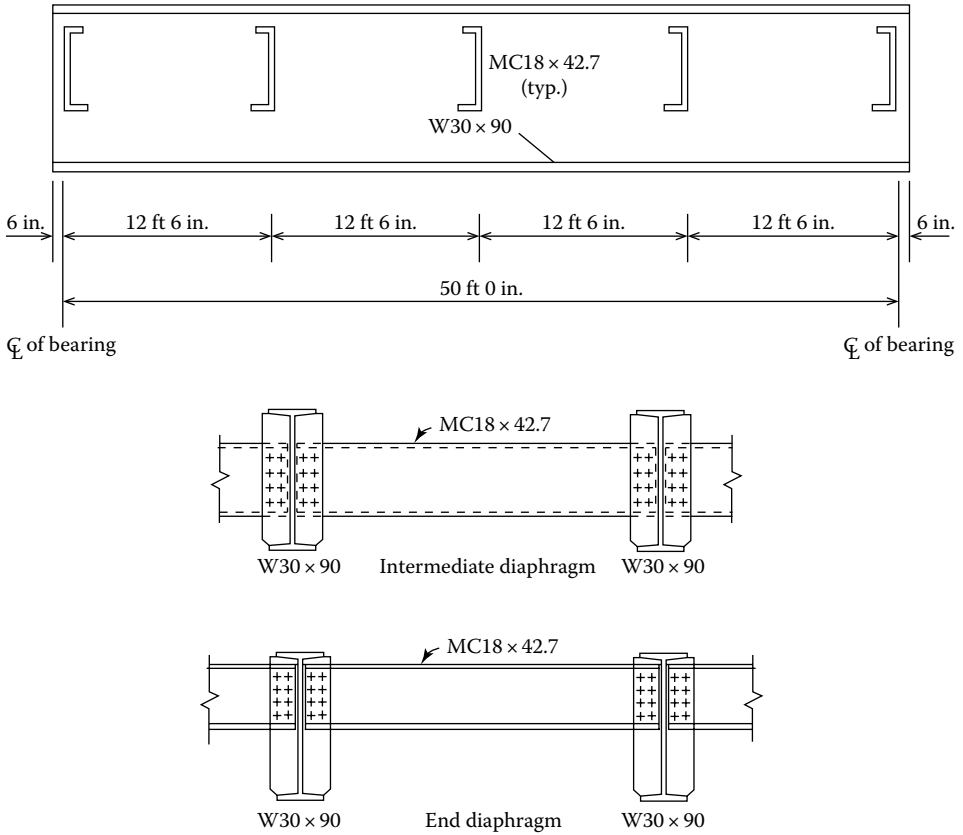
Location of intermediate and end diaphragms. (a) Elevation of girder showing end diaphragms. (b) Diaphragms bolted to girders.
